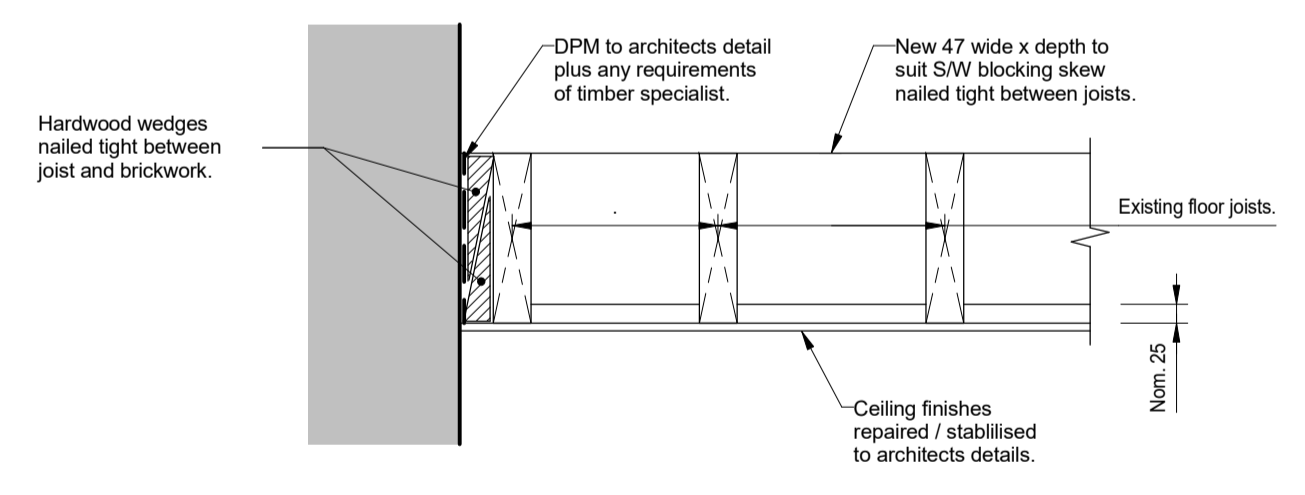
Protection to End of Timber Joist Where Vulnerable to Decay: Option 1
